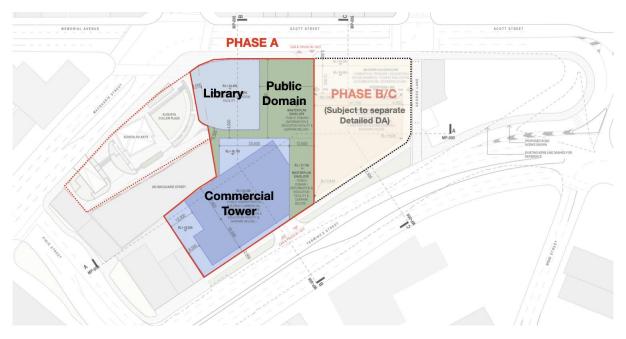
Liverpool Civic Place Stage 1 site (subject site)
